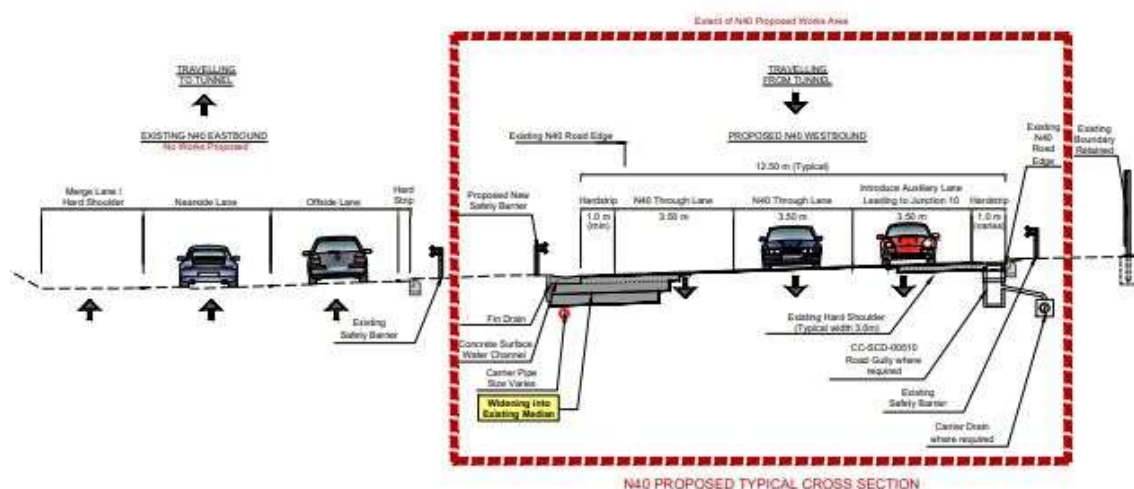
Proposed Extension to N40 (South Ring Road) - Cross Section
